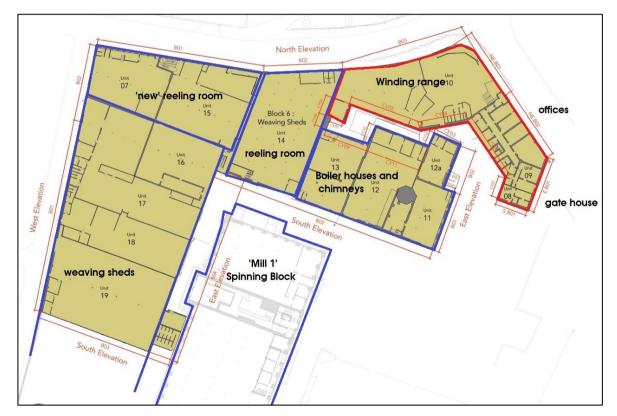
Plan of Buildings Listed under Mill 1 Listing (Buildings in red fall under separate Listing)
